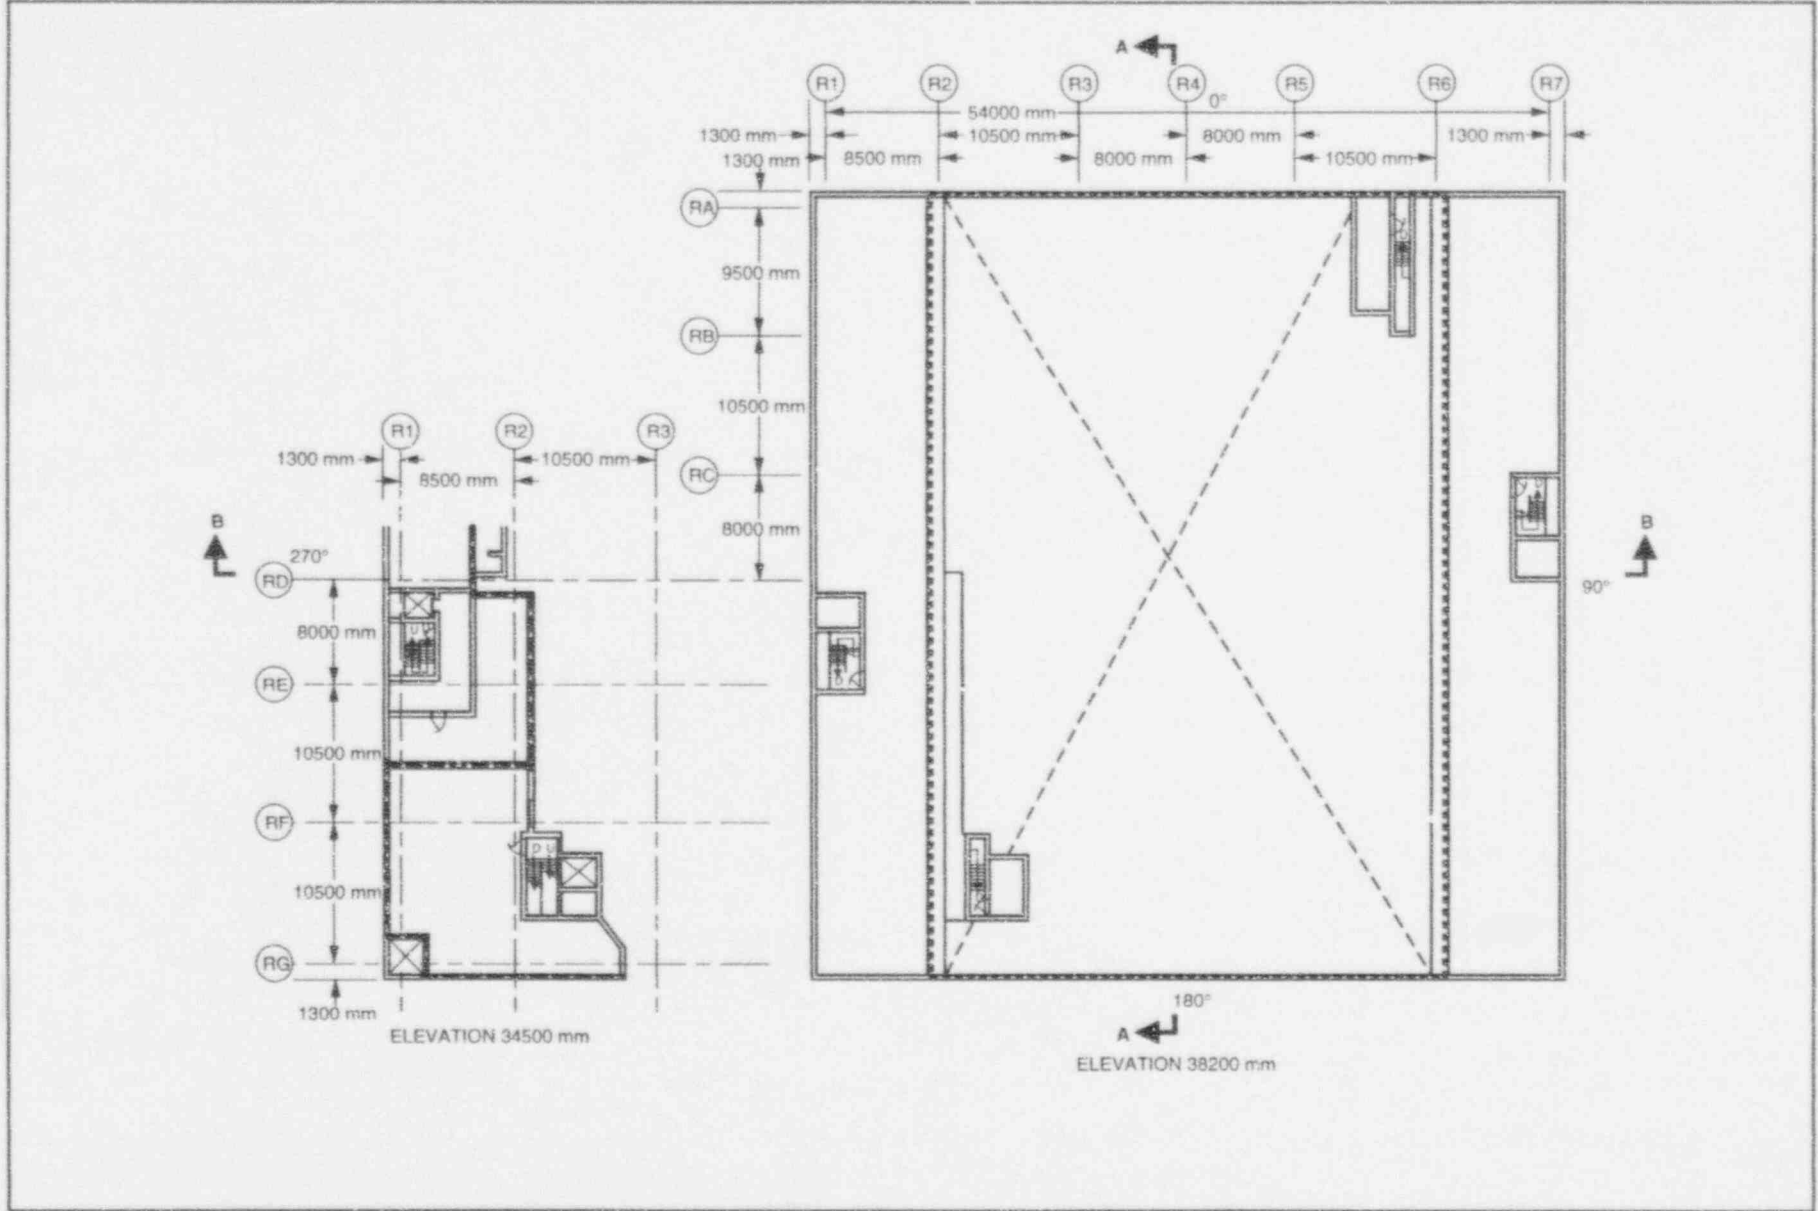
Reactor Building Arrangement—Elevations 34500 mm and 38200 mm
